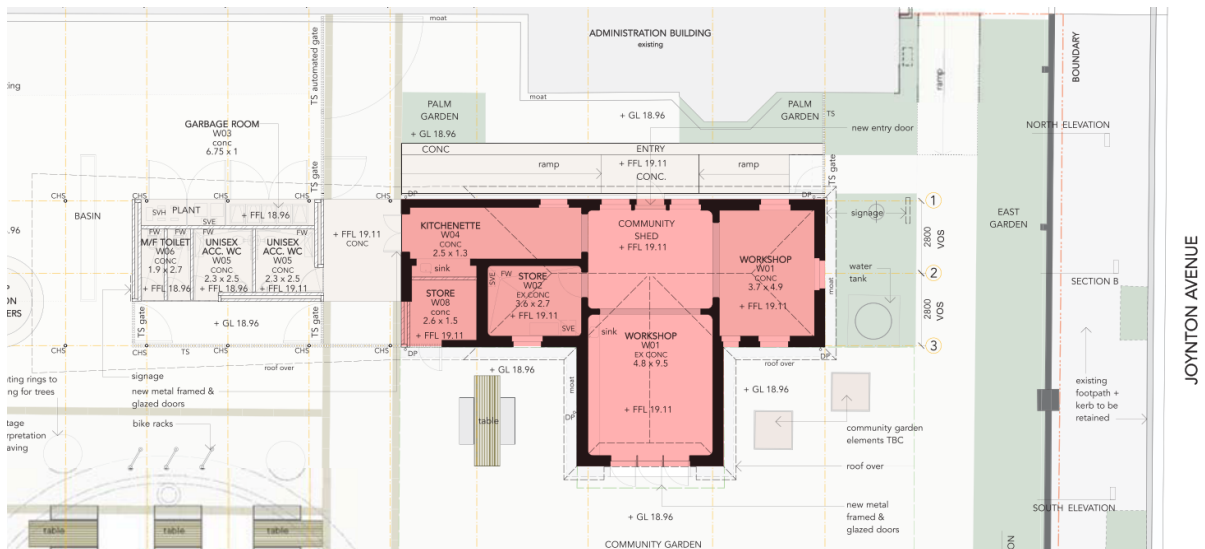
Existing floorplan with 'Banga Shed' shaded red
